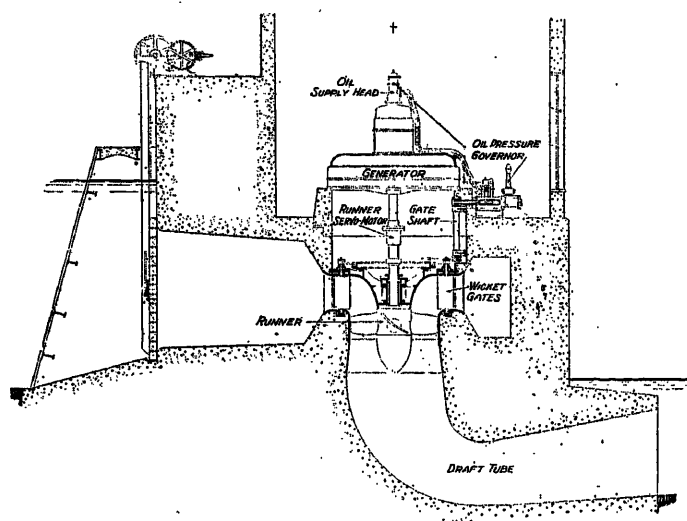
SCHEMATIC VIEW OF REGULATING MECHANISM
